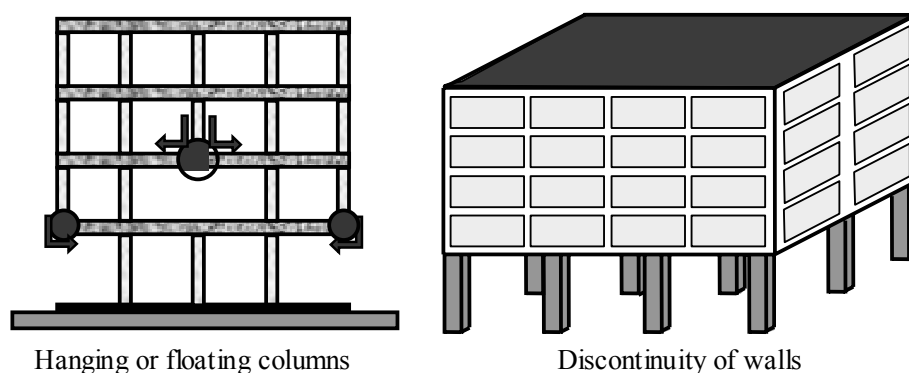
Buildings with discontinuities in columns or walls (Ref. 0.16)
